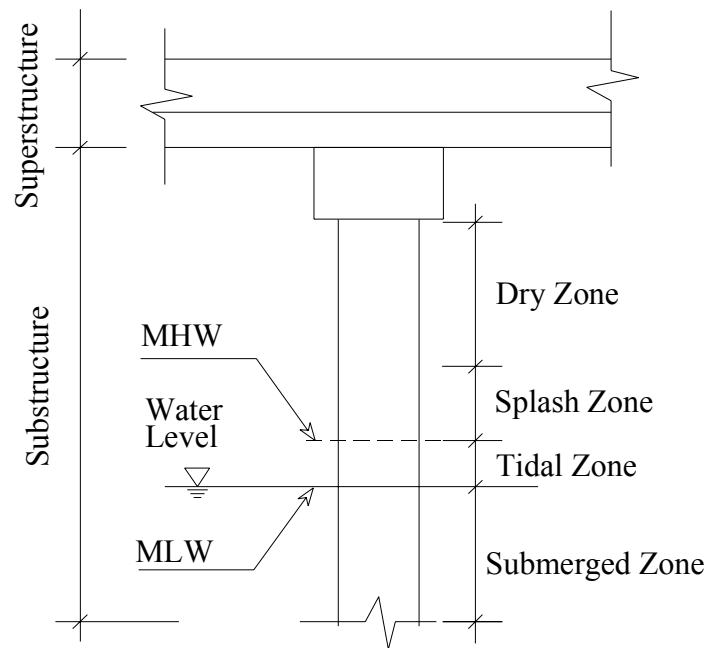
Chloride Exposure Zones of a Typical Bridge Structure.
